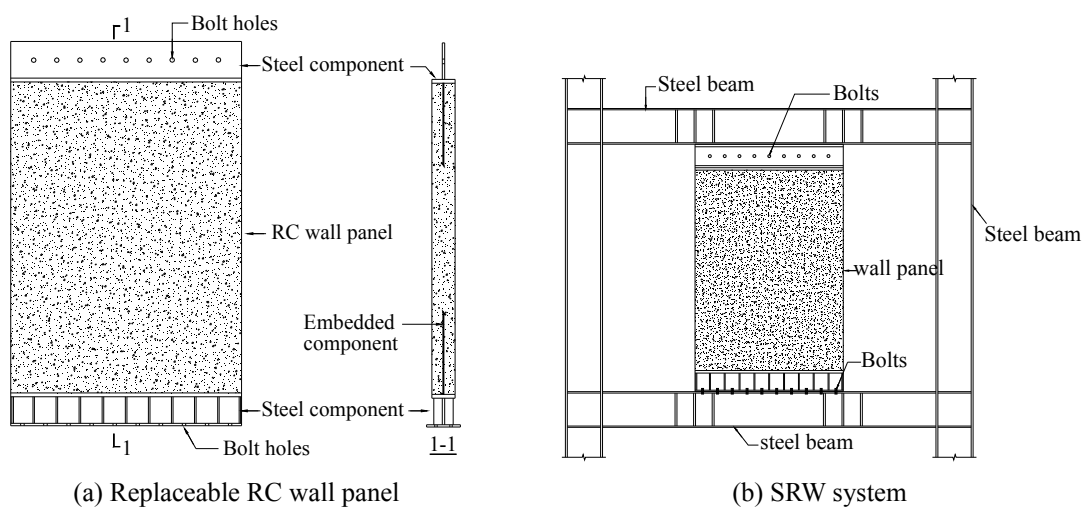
Steel moment frames with replaceable reinforced concrete wall panel (SRW) structural system
